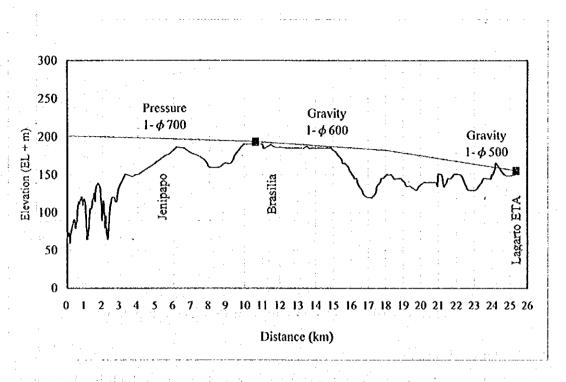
Vertical Profile of Plaultinga Pipeline in Phase 1
